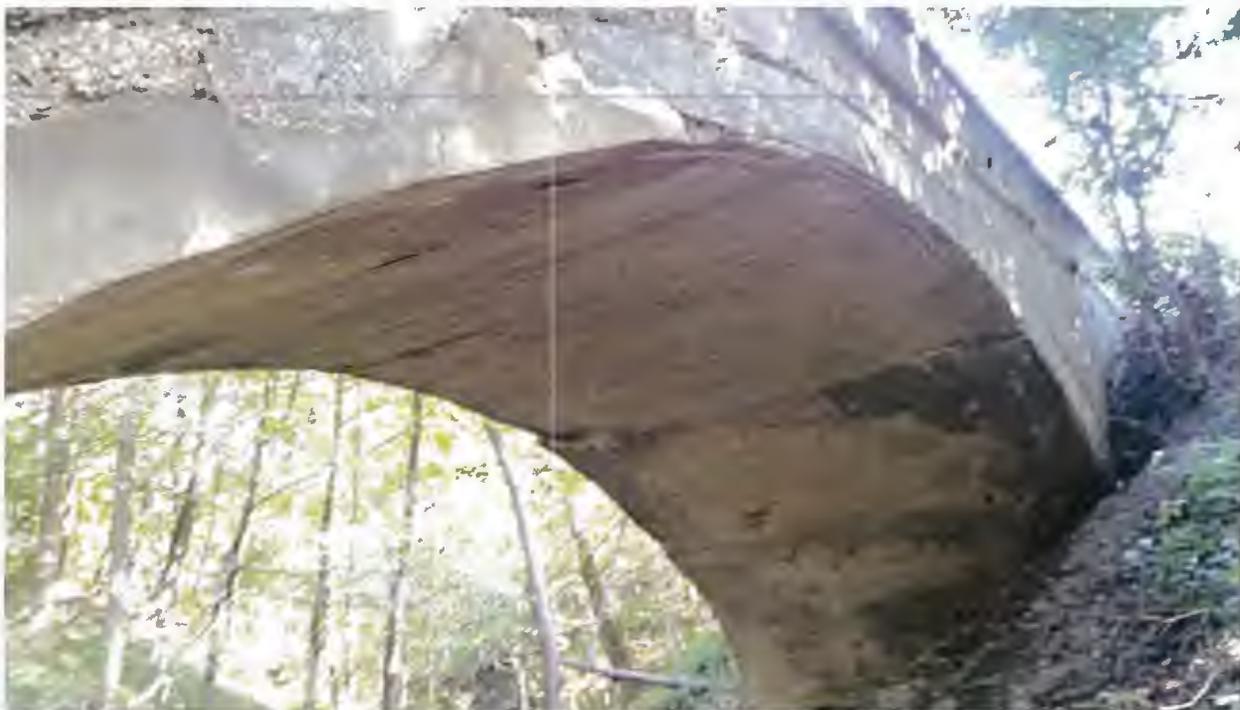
Central Av Bridge, Southwest Arch Bridge Superstructure Condition, 08/19/2014
